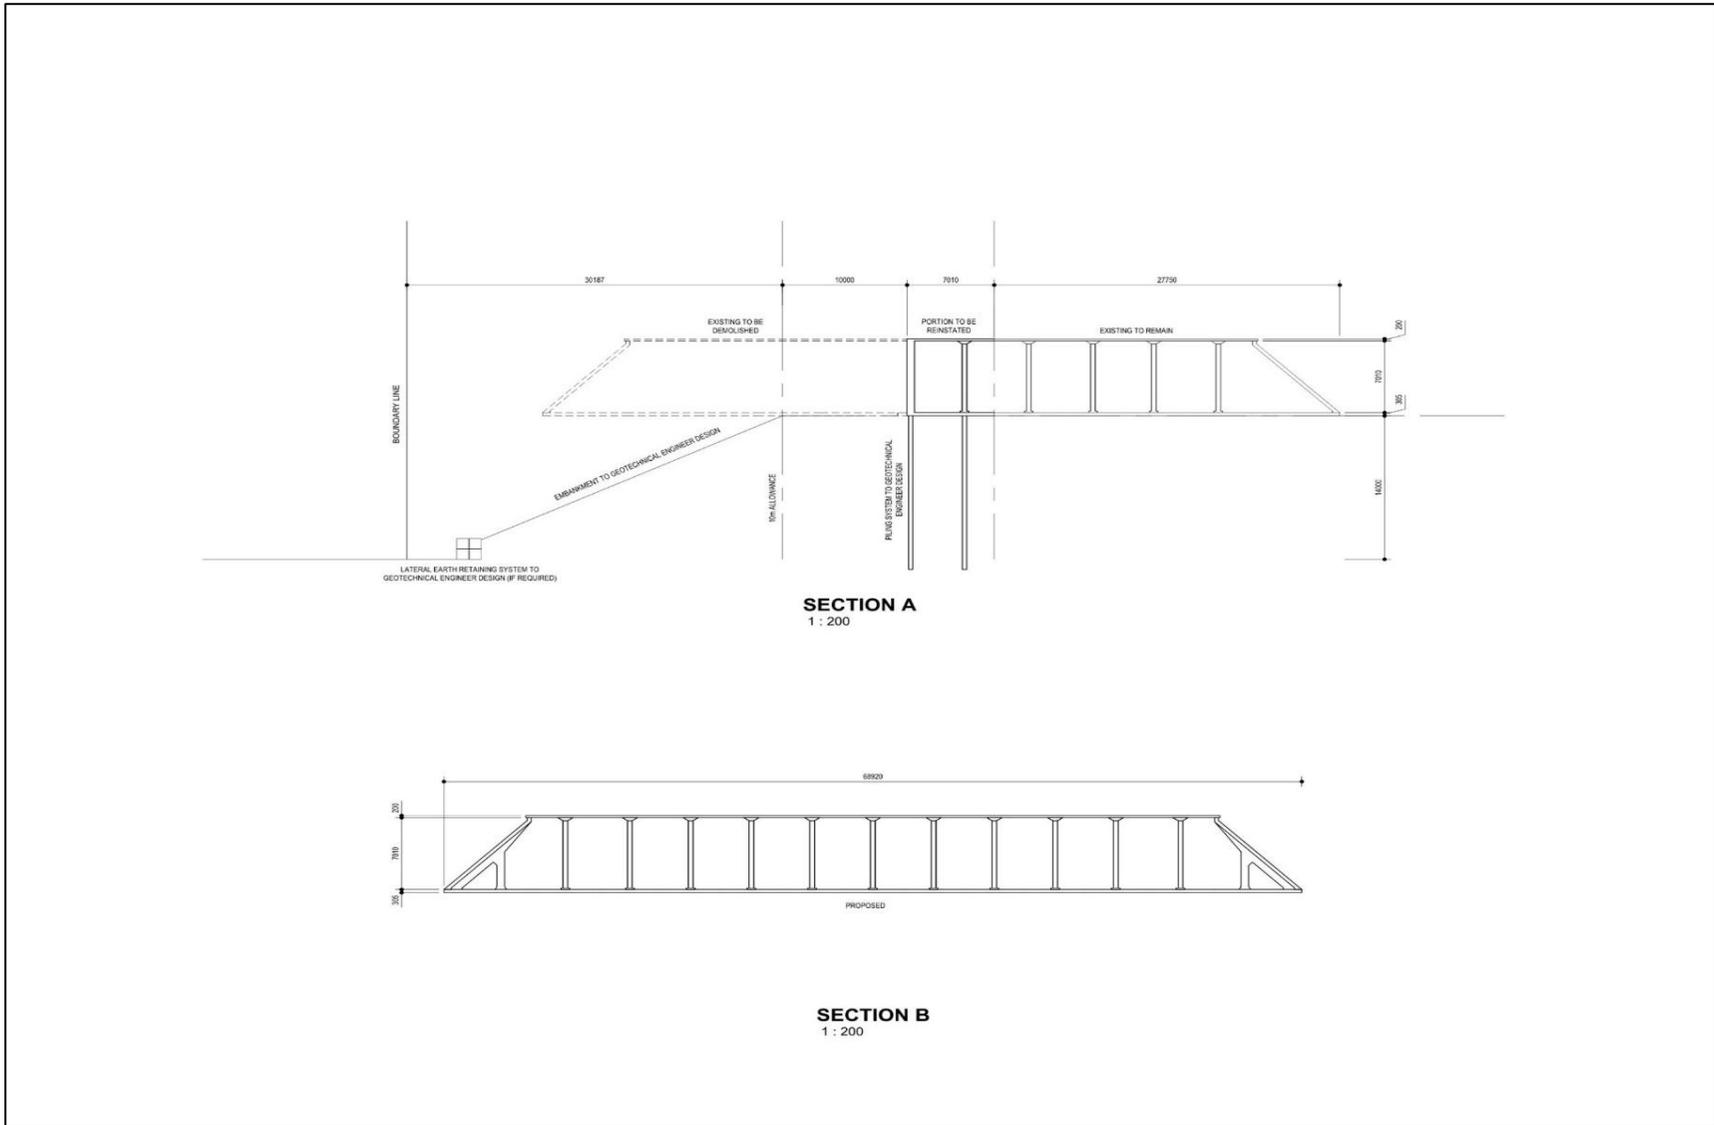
Cross-Section A & B - Proposed Solution for Reinstatement of Reservoir No 2: Damaged portions to be demolished and new section to be built
